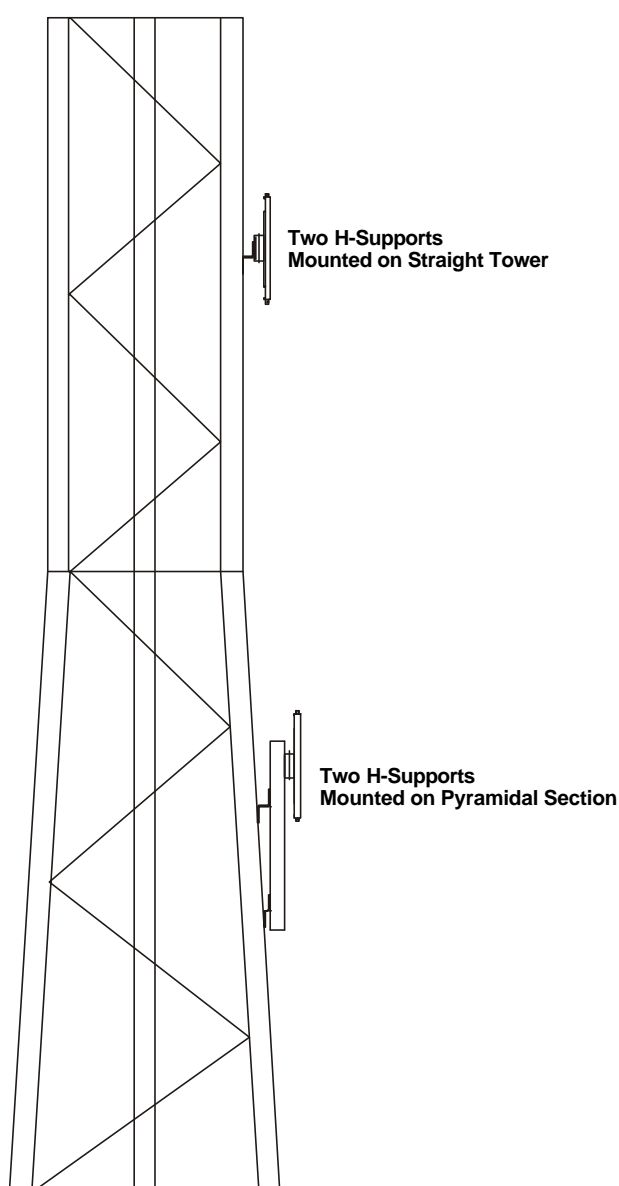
Typical H-Support Installations on Wide Towers, Side View
